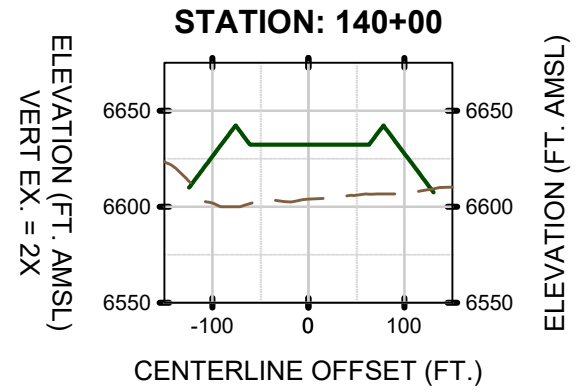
CLOSURE PLAN - COBRE HAUL ROAD - STA 58+65 TO 134+00 - SECTIONS
